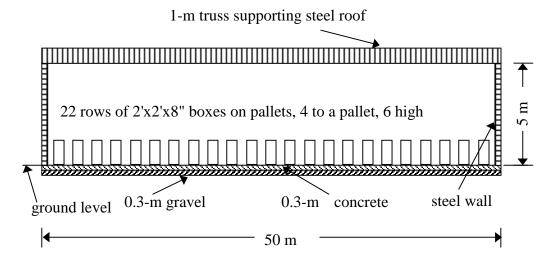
Elevation View of a Storage Building with Storage Configuration
